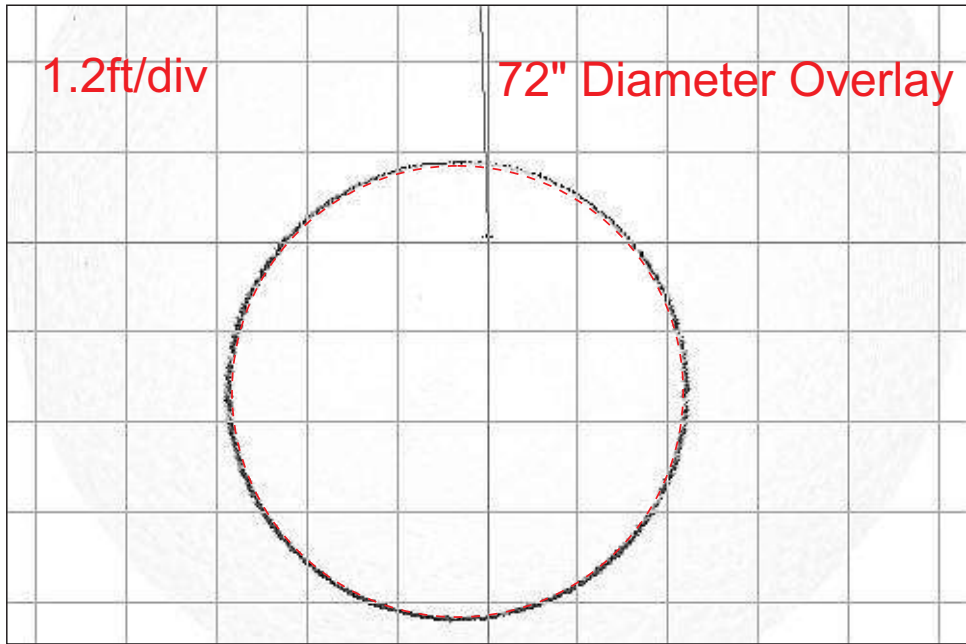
Sonar Profile 4 - 634 feet downstream of Access Point 1.
